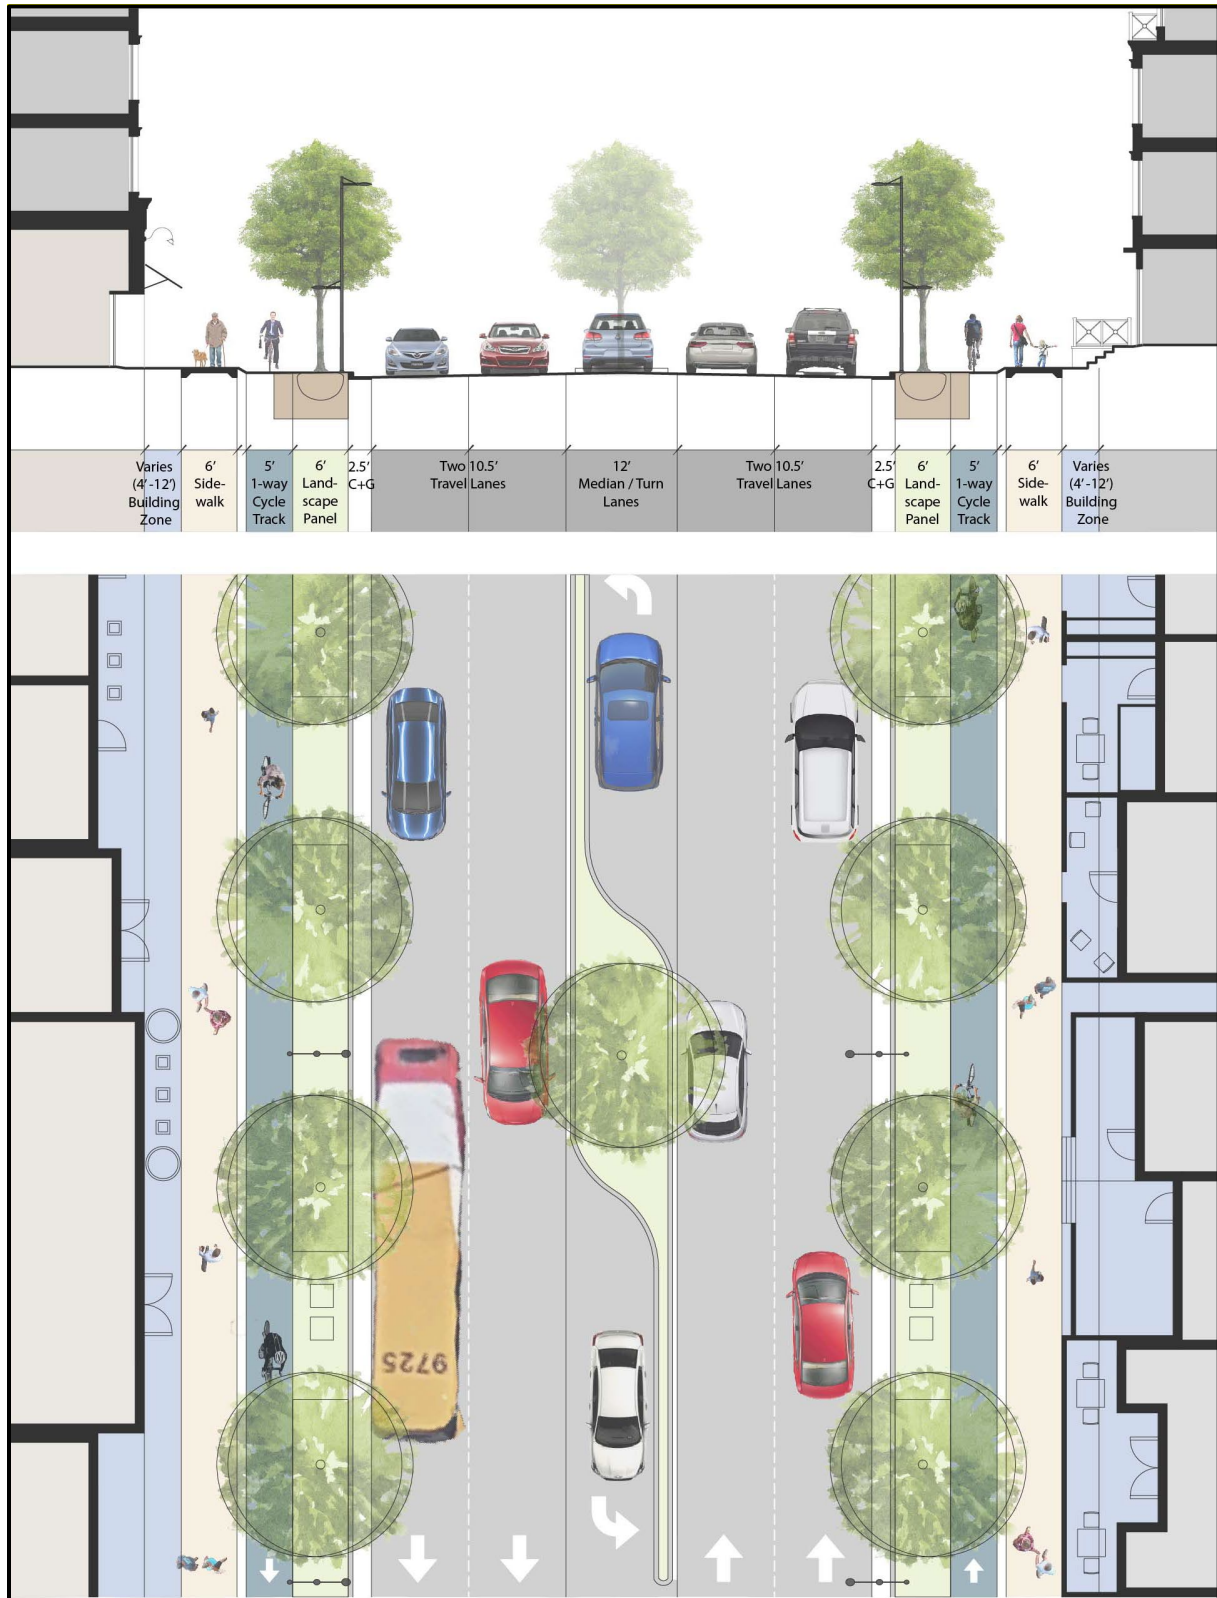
Chain Bridge Road (Avenue Type 2) cross-section
